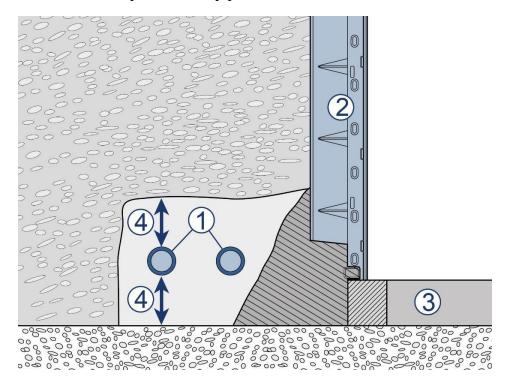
Backfilling of hydraulic and electrical networks Legend:
